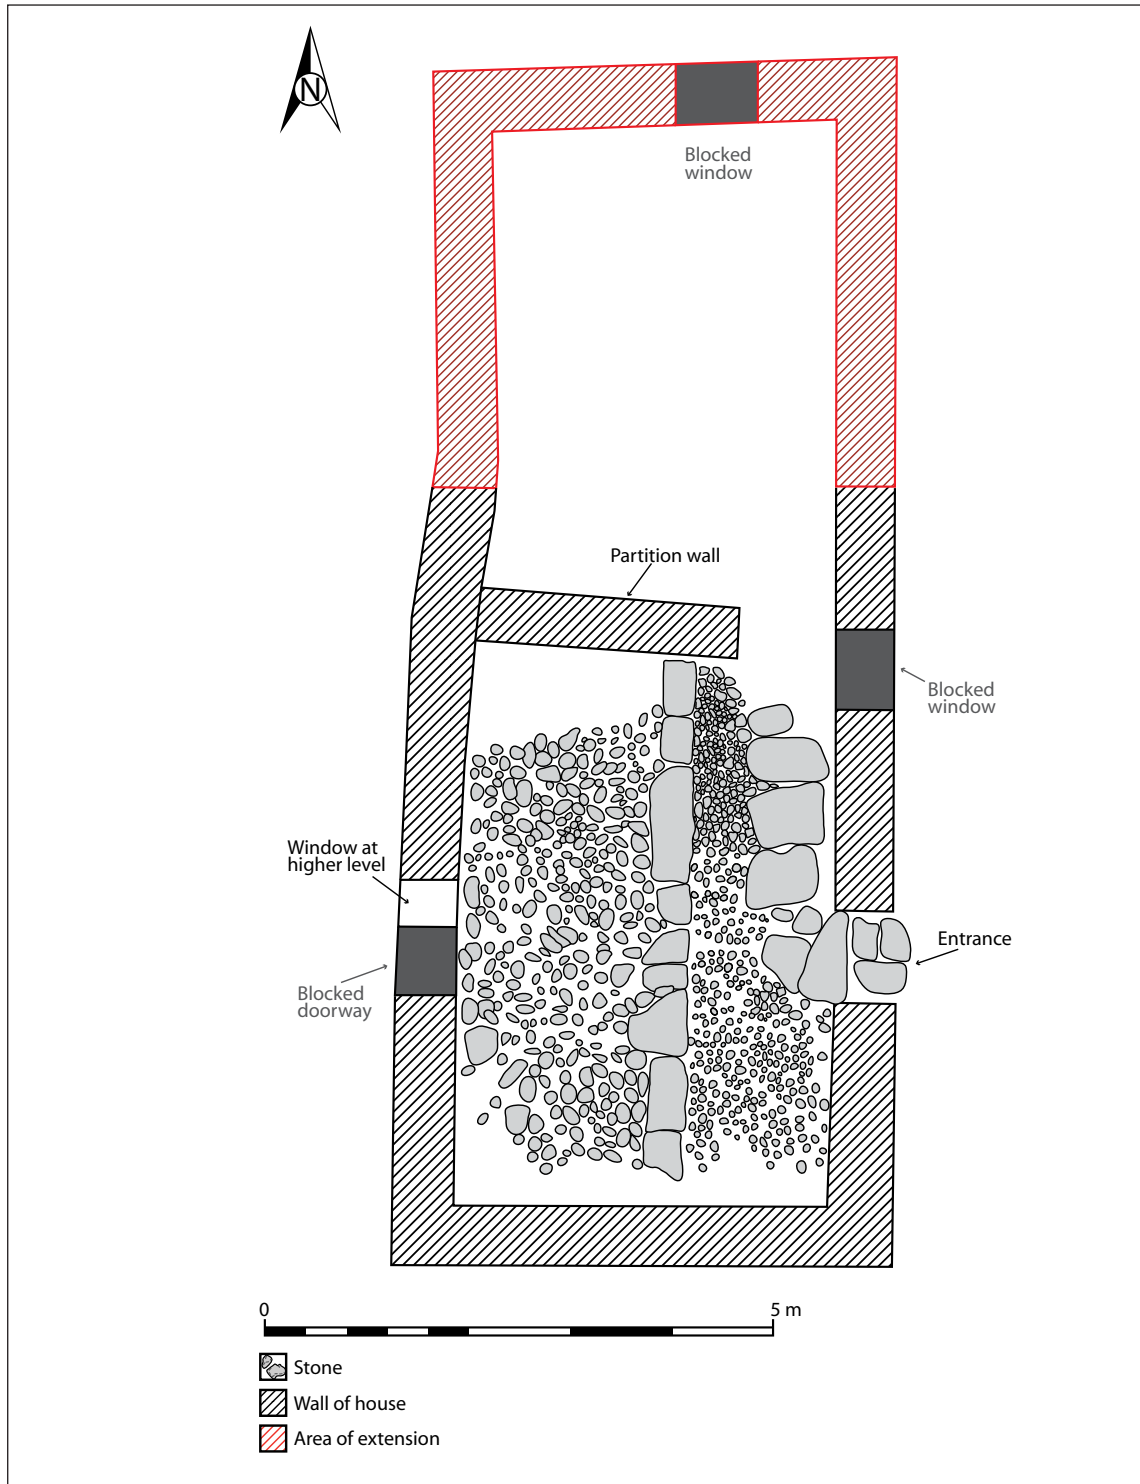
Cloonlara: ground-floor plan of two-roomed building, with extension highlighted in red.
